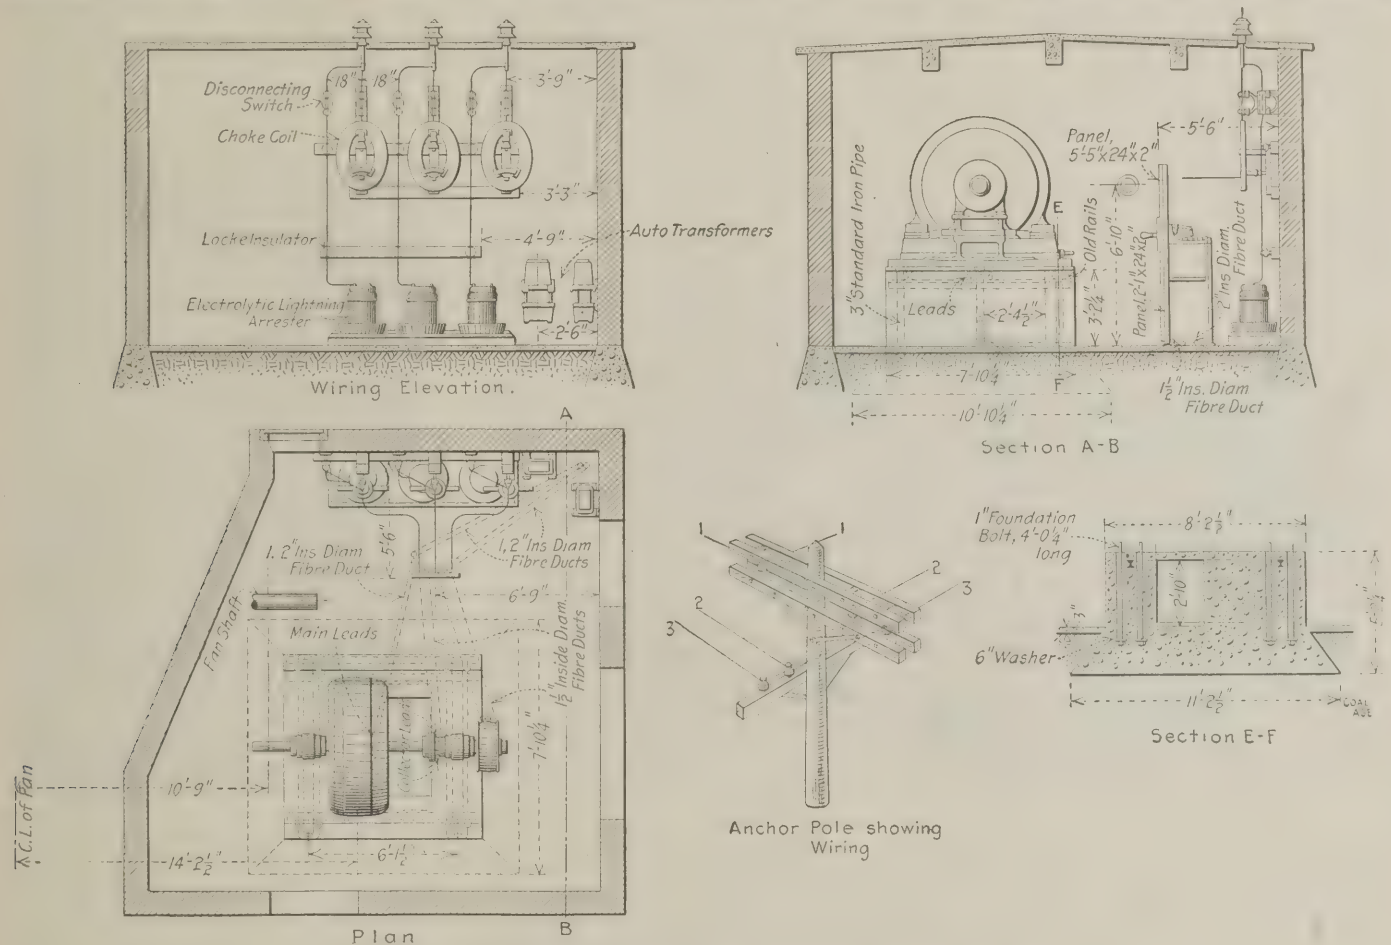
MOTOR ROOM OF FAN HOUSE, SHOWING WIRING DETAILS
